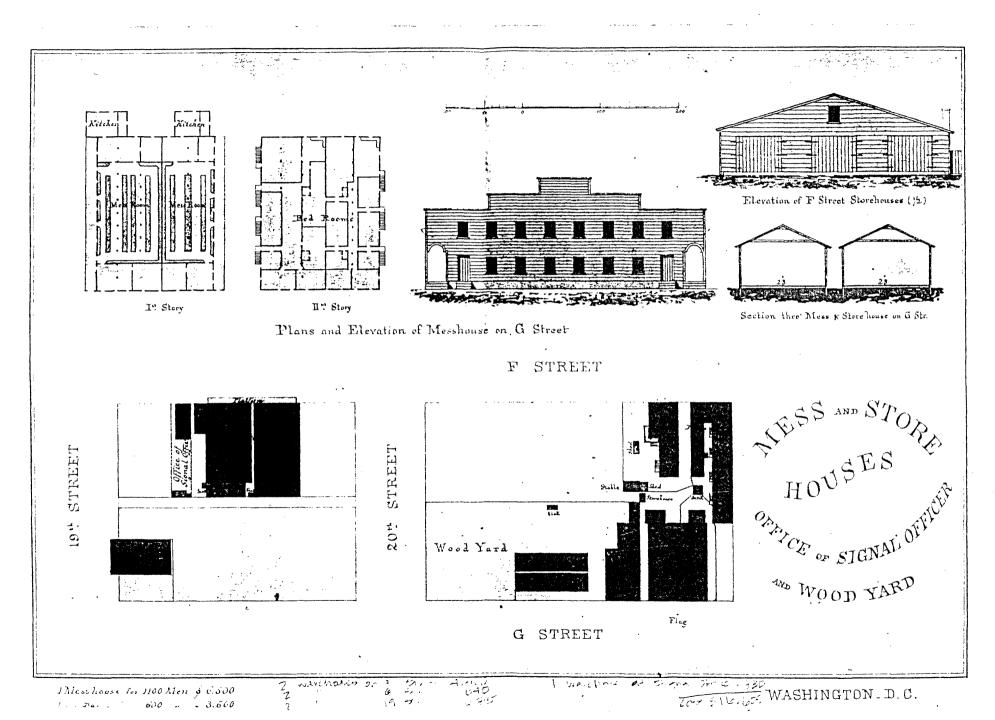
Plans and Elevations of MESS AND Store Houses
